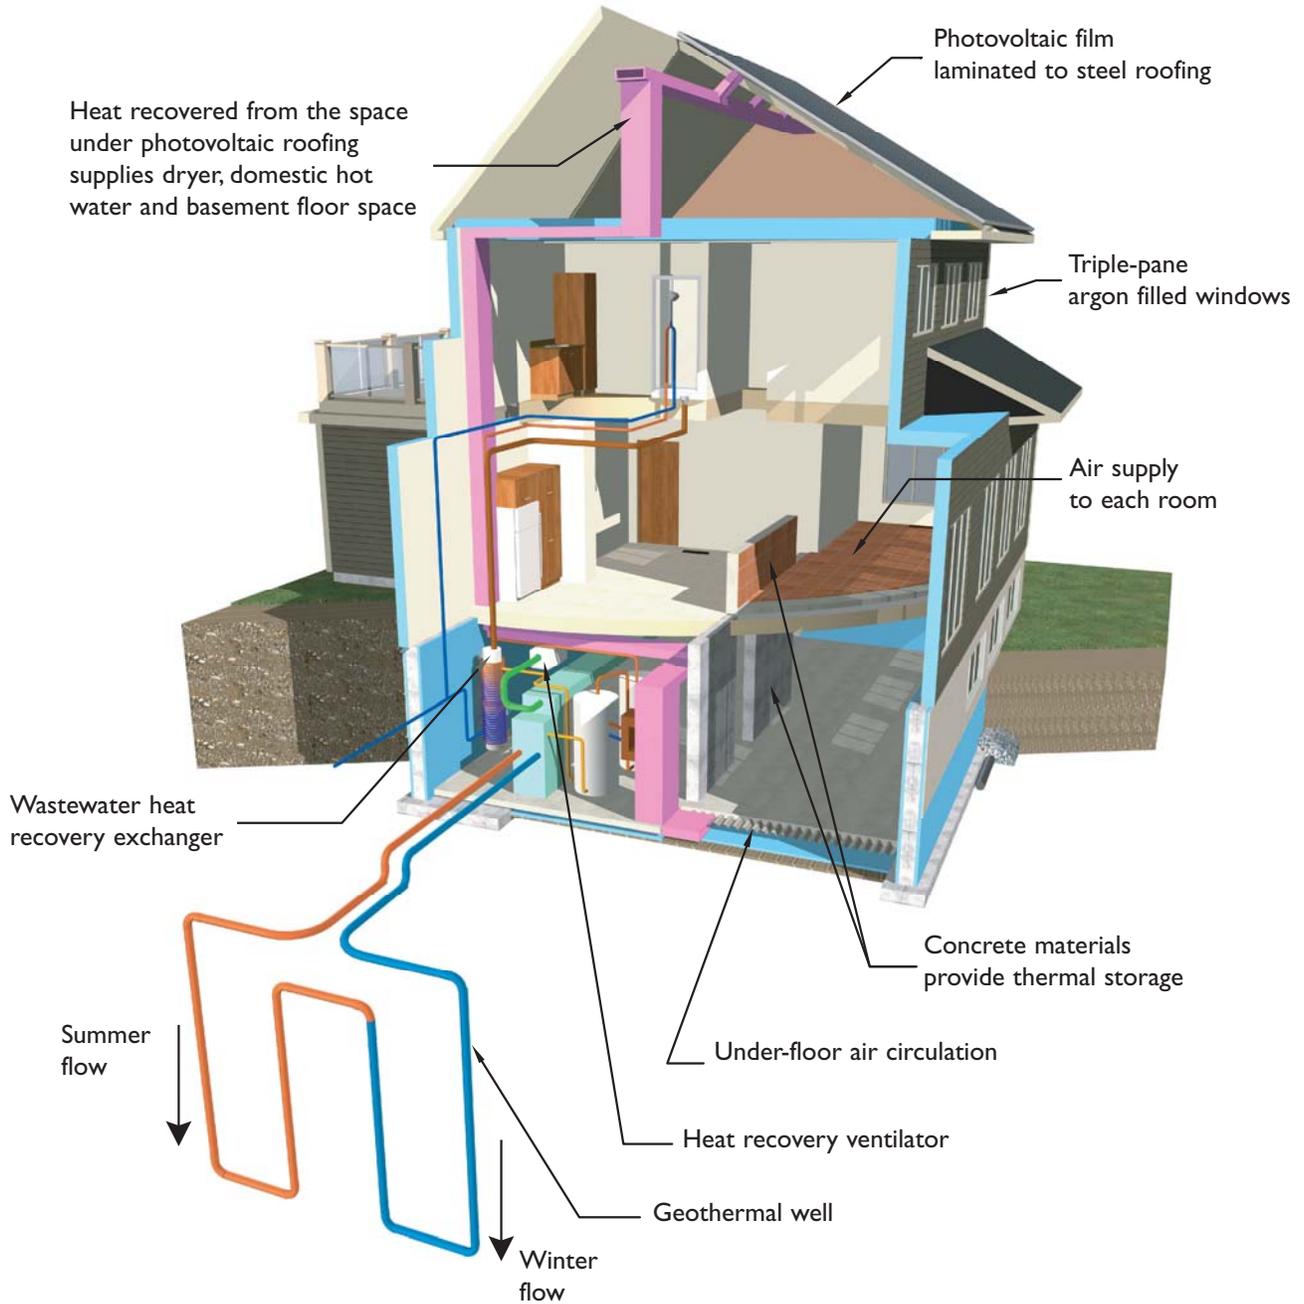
Cross-section of ÉcoTerra™, showing space and water heating technology
